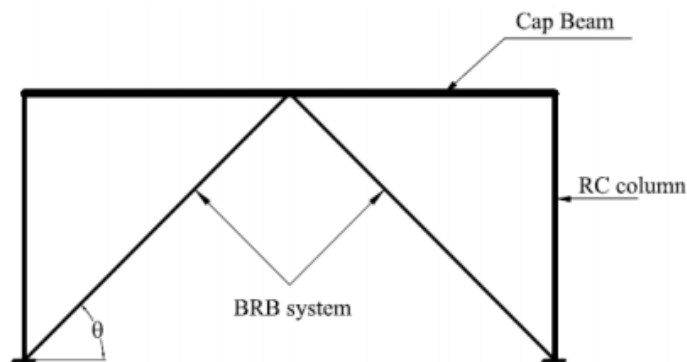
Layout of BRB Retrofit Scheme (El-Bahey and Bruneau, 2010)
